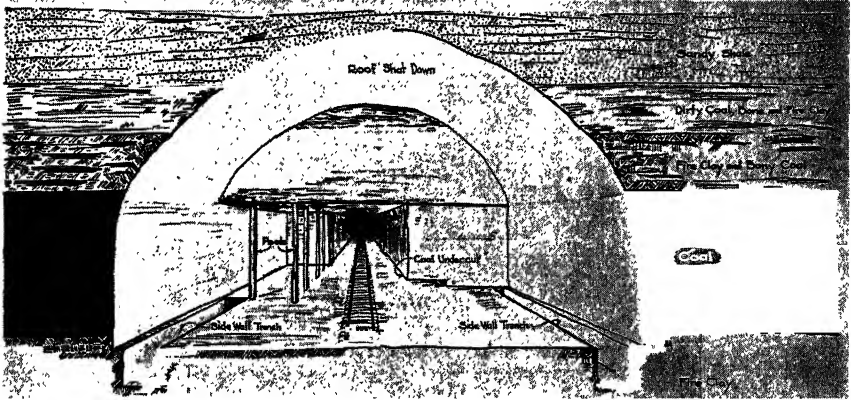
SKETCH SHOWING PROCESS OF EXCAVATION, MAIN LOADED TERMINAL.
